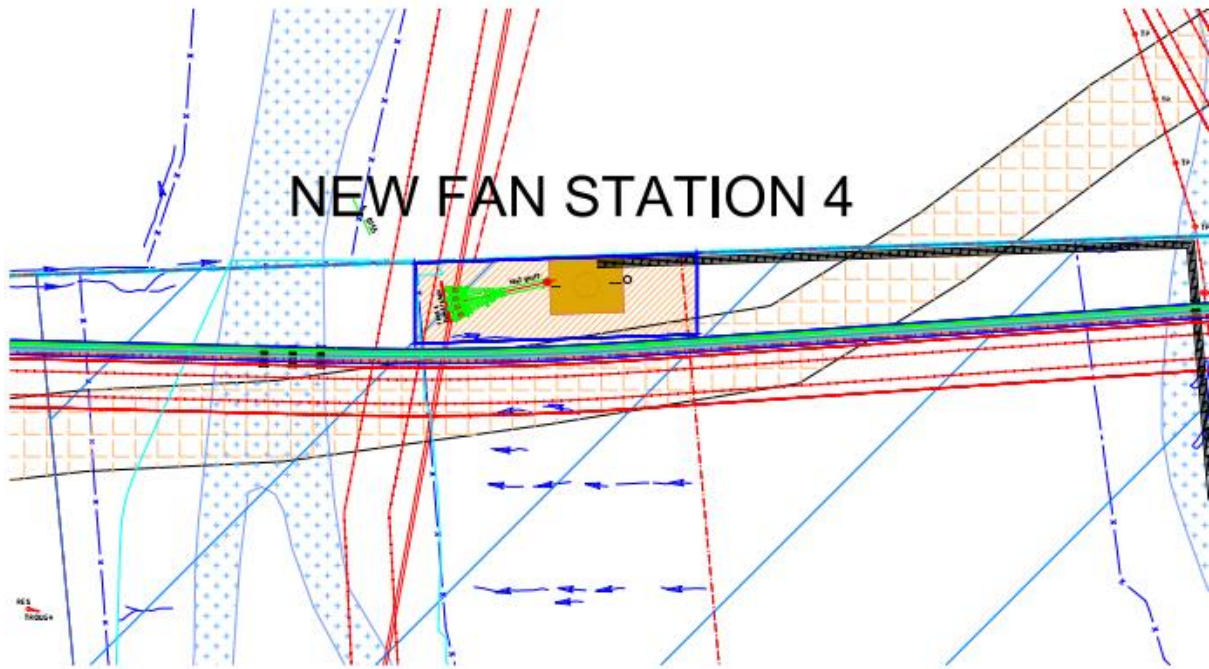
DETAILS OF MINING AND IN FRASTRUCTURE PLANS.
